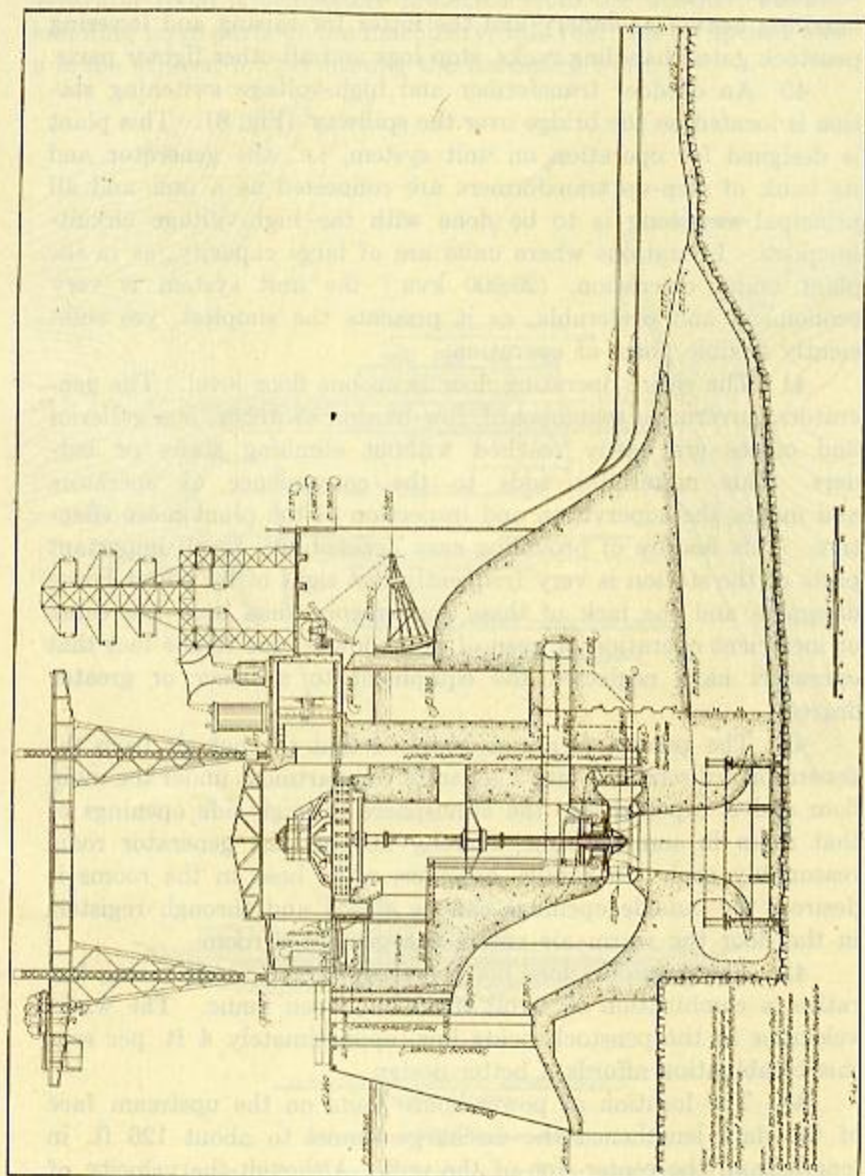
CROSS-SECTIONAL ELEVATION VIEW OF THE POWER HOUSE
